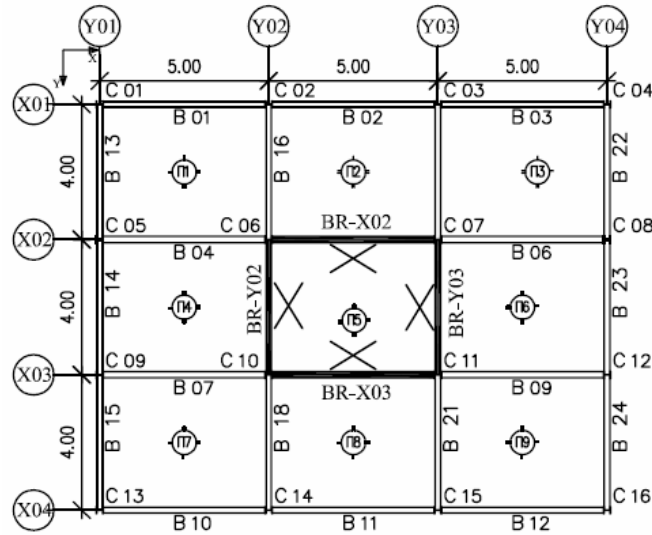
Typical layout of 3-story torsionally flexible steel buildings.
